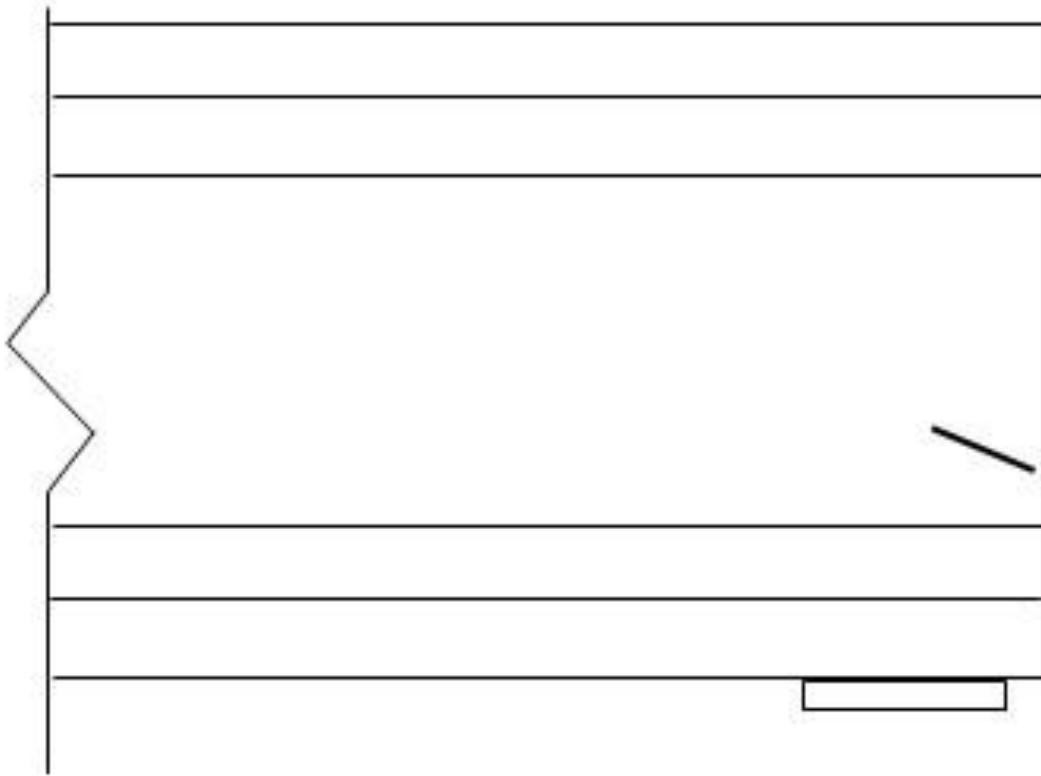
Crack diagram for girder 2nd from west side, west face, south abutment (#1829).
